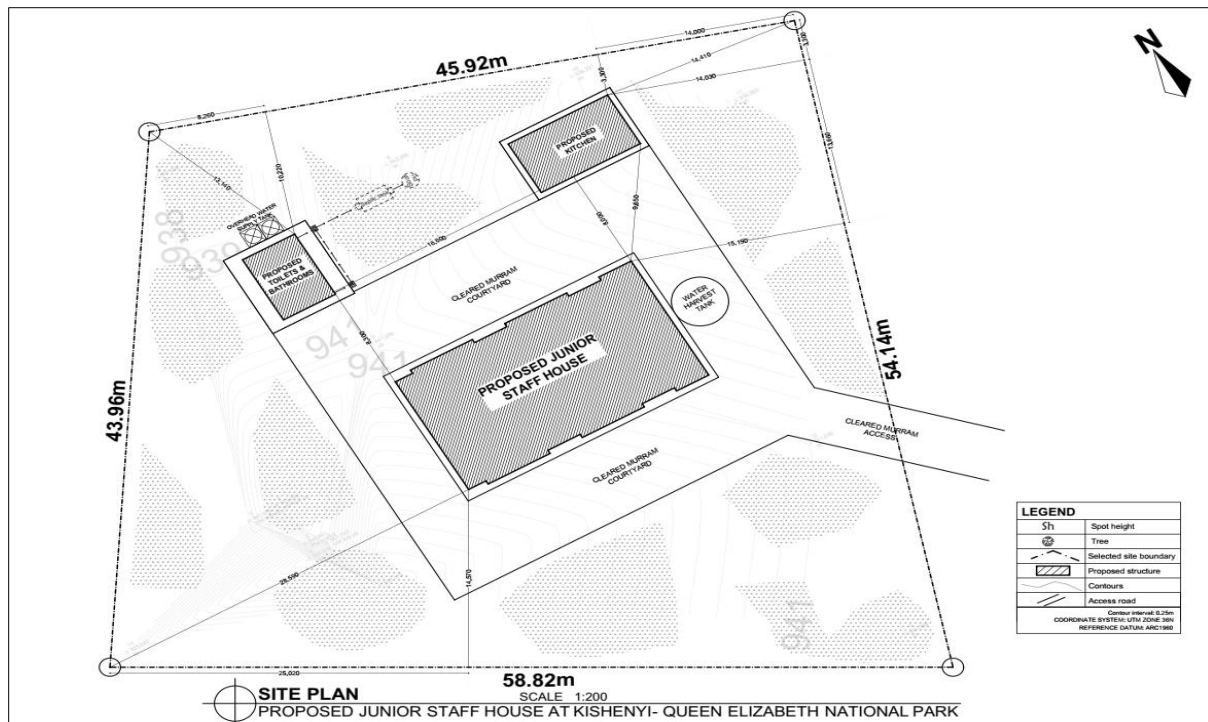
Kisenyi Junior Staff Accommodation Site Plan
